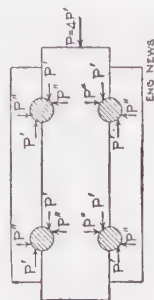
Pin Pressure on Pin-keyed Joints.
